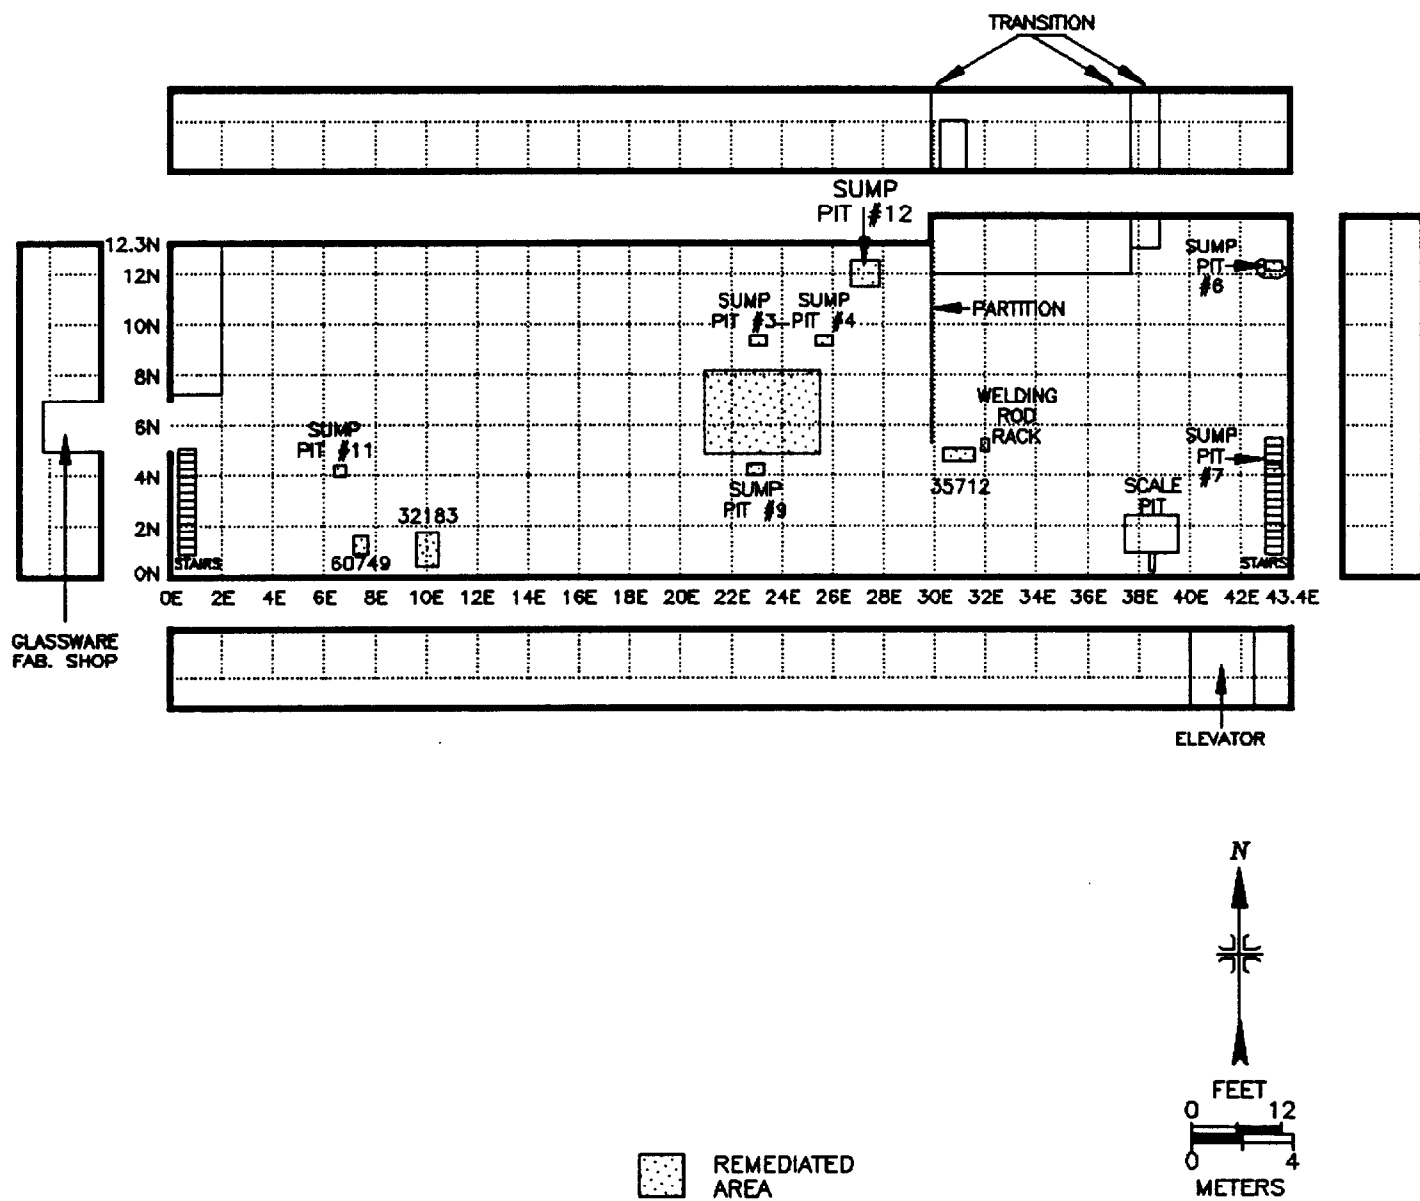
Building 28, Basement – Remediated Areas on Floor
